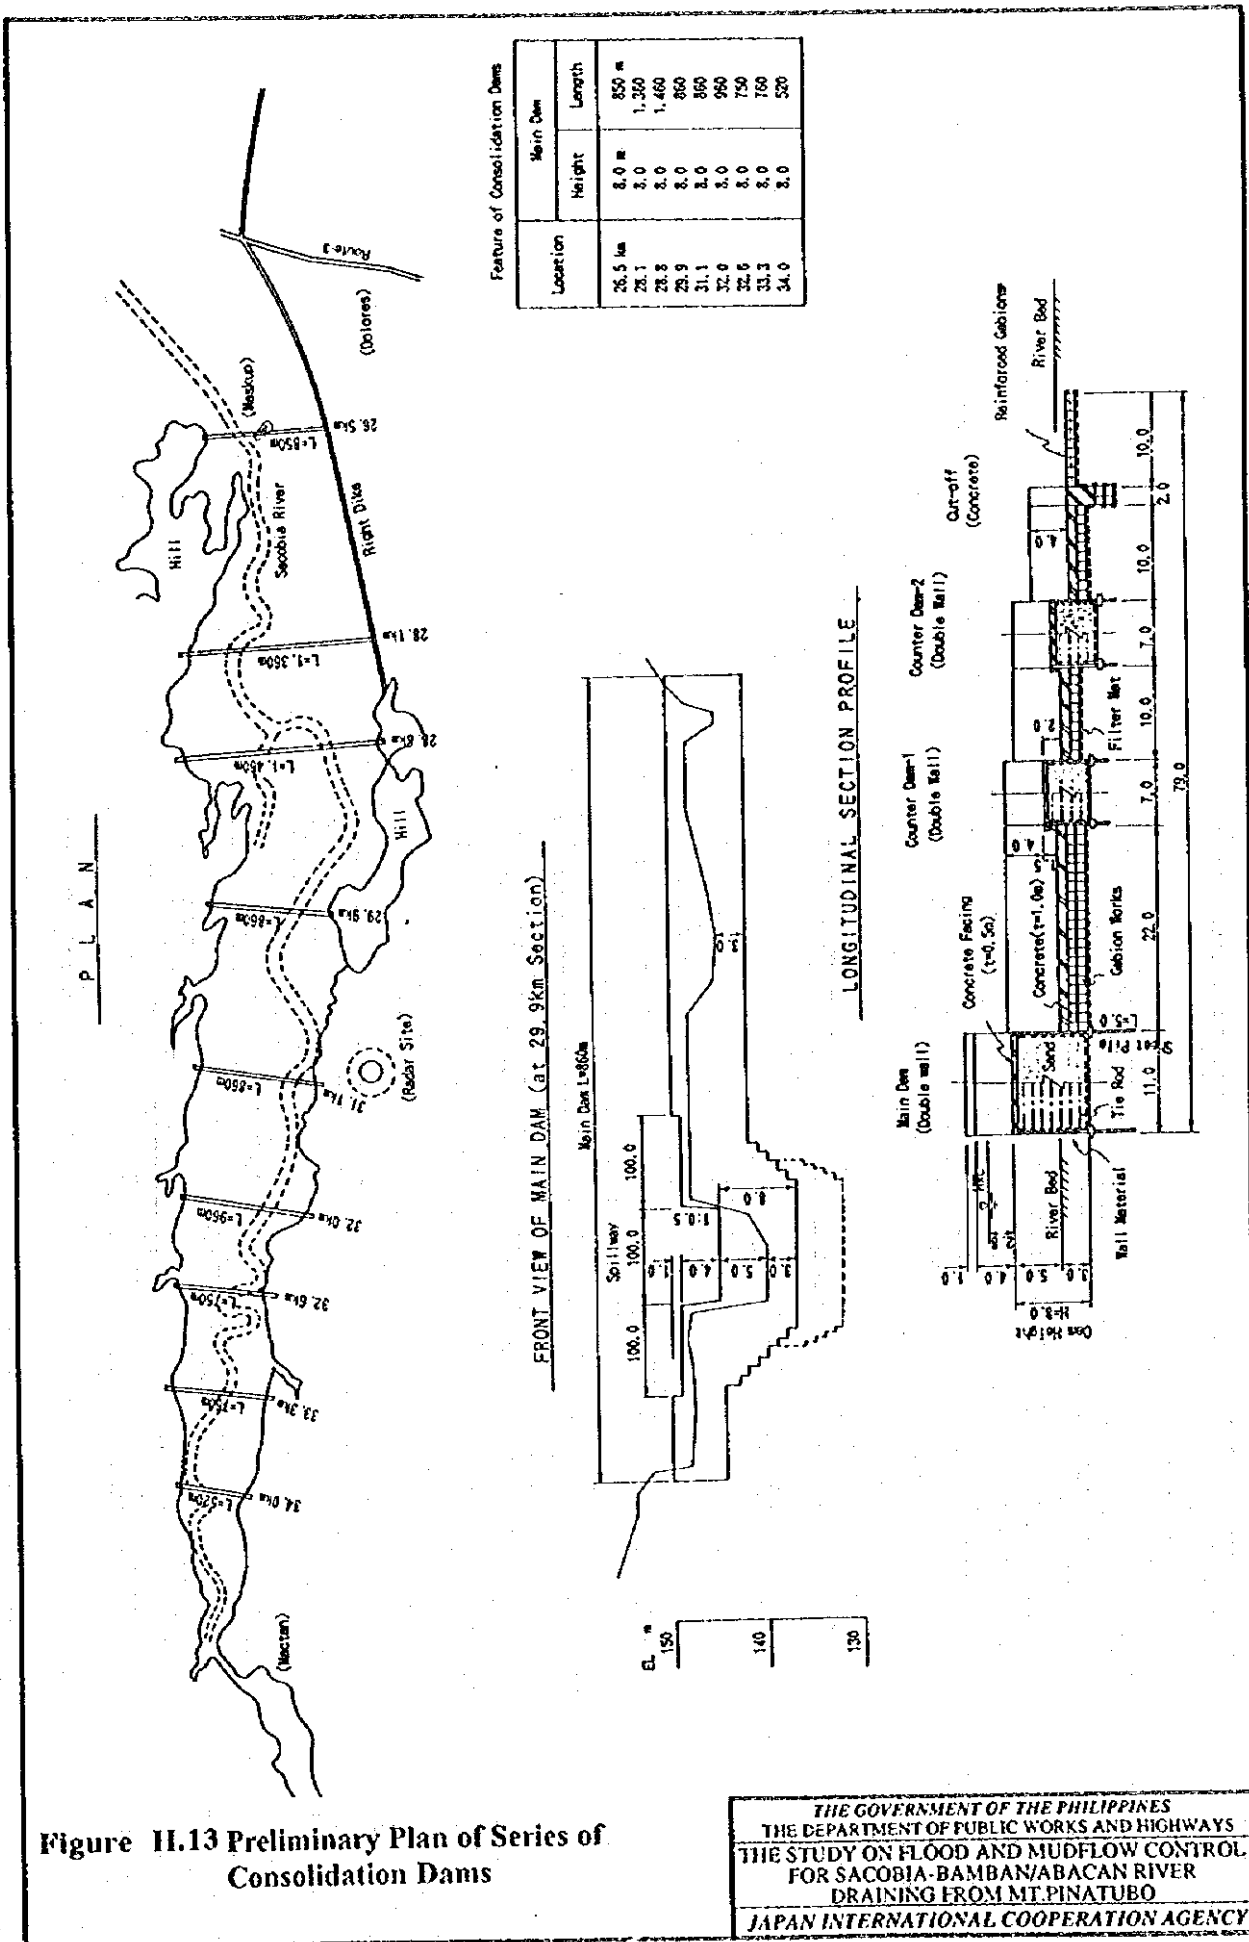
Preliminary Plan of Series of Consolidation Dams
